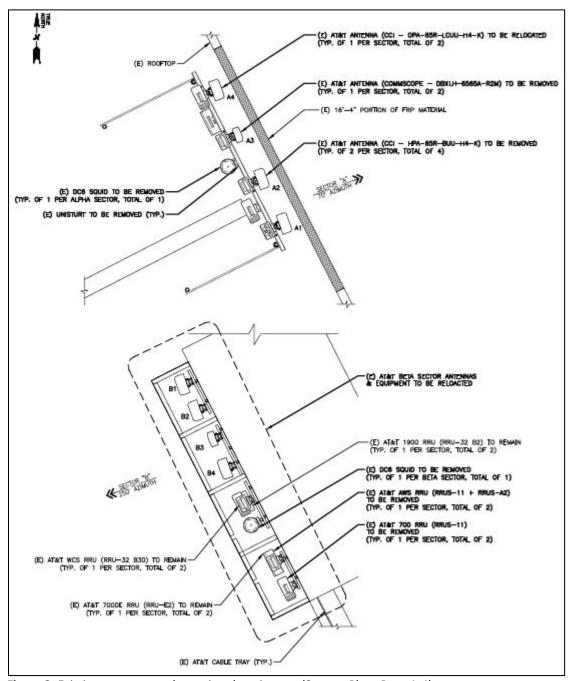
Existing antennas and associated equipment (Source: Plans Page A-4).
